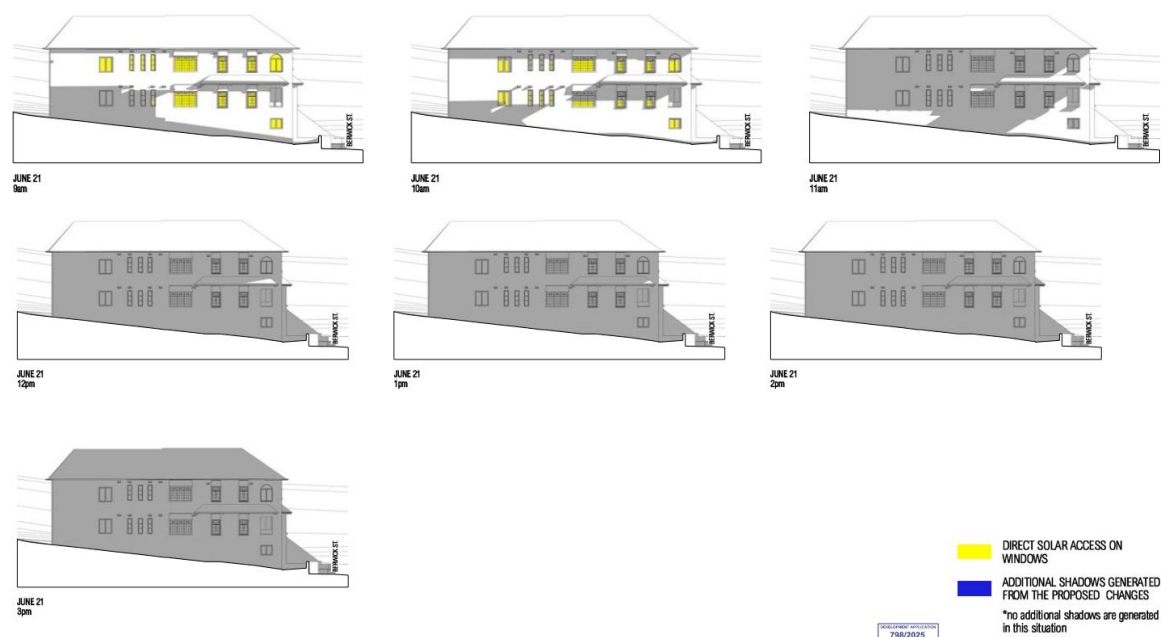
North elevational shadow diagrams for 1 Berwick Street, Coogee
